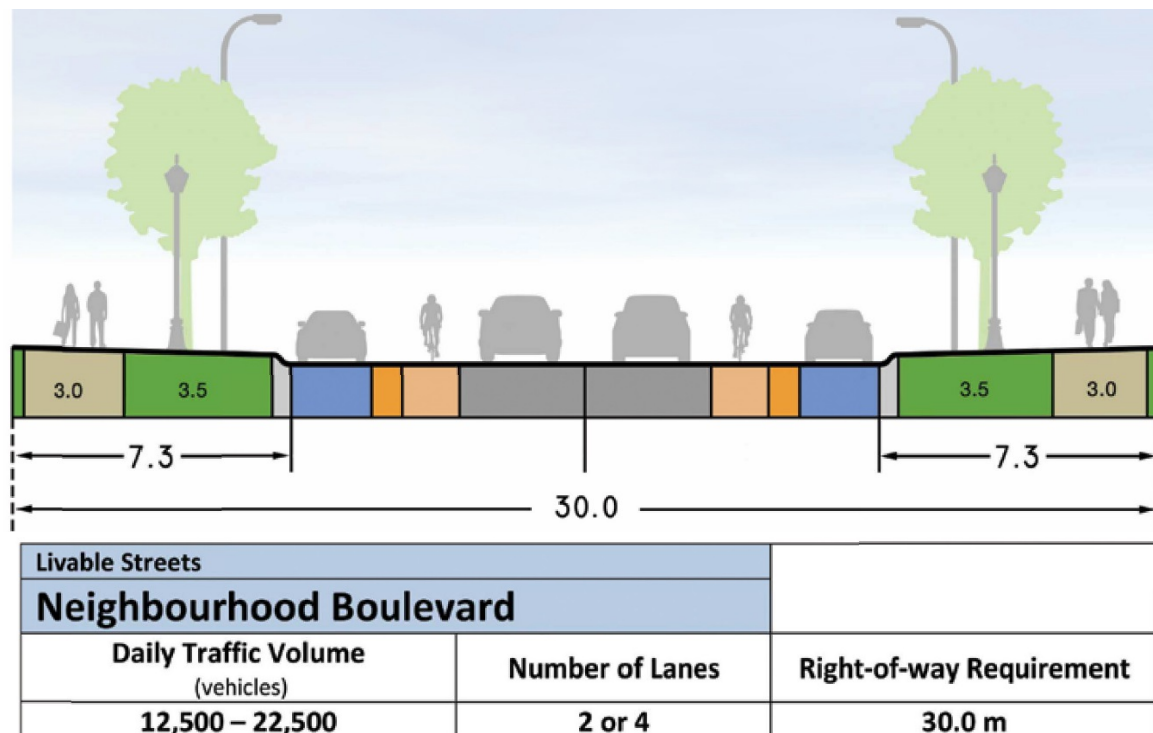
NEIGHBOURHOOD BOULEVARD SECTION
